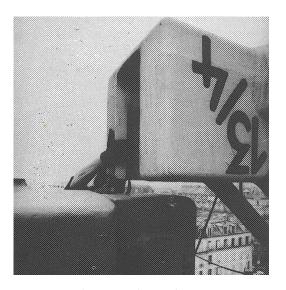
Pompidou, truss-gerberette 'slip-on' connection
